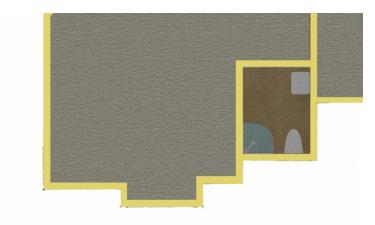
Guest Bathroom - natural light while not seen on the floor due to the overhang above the light does climb up the north wall
